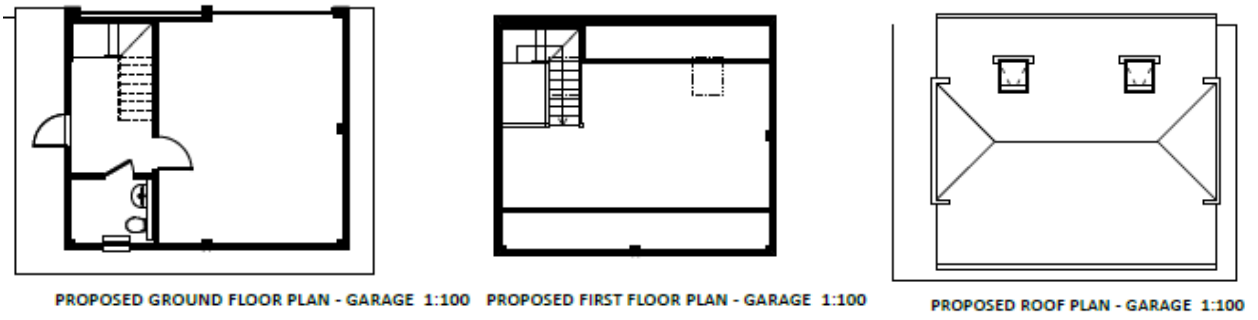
Latest approved floor plans for garage building (17/01646/HOUSE)
